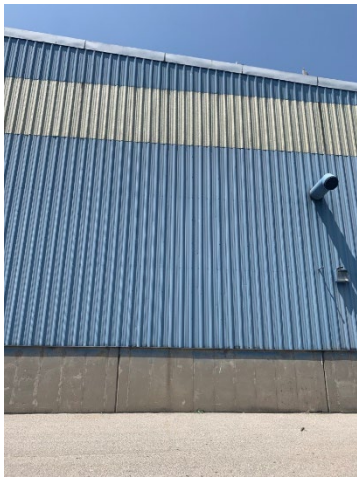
Translucent fiberglass clerestory panel on the south side has some staining and is in fair condition.
